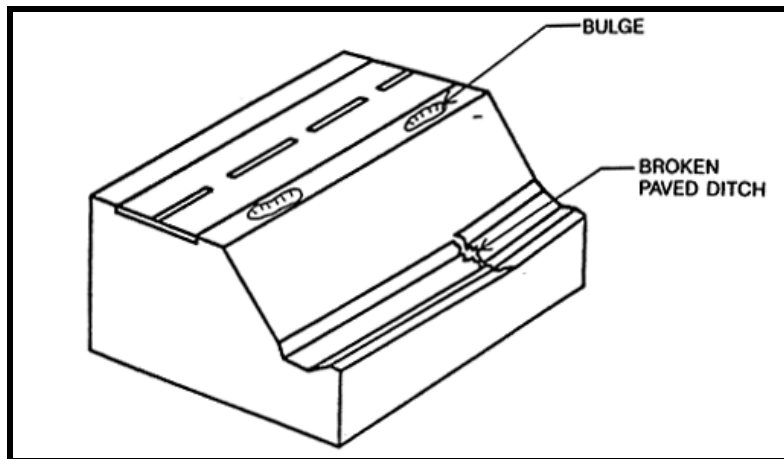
Bulge of pavement and broken paved ditch (FHWA, 1988)
